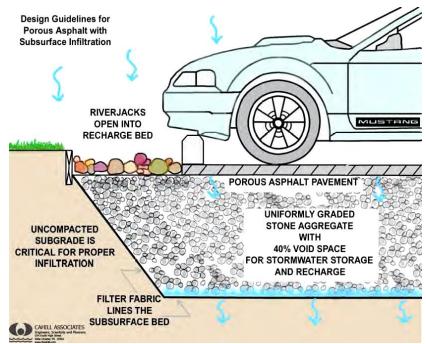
Diagram of the use of porous asphalt pavement in a parking lot.
